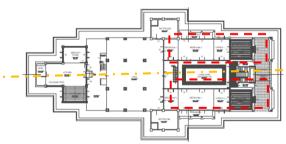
Baitul Rahmah, Perak – plan shows the two protruding elements at both at right and left sides of the building.
